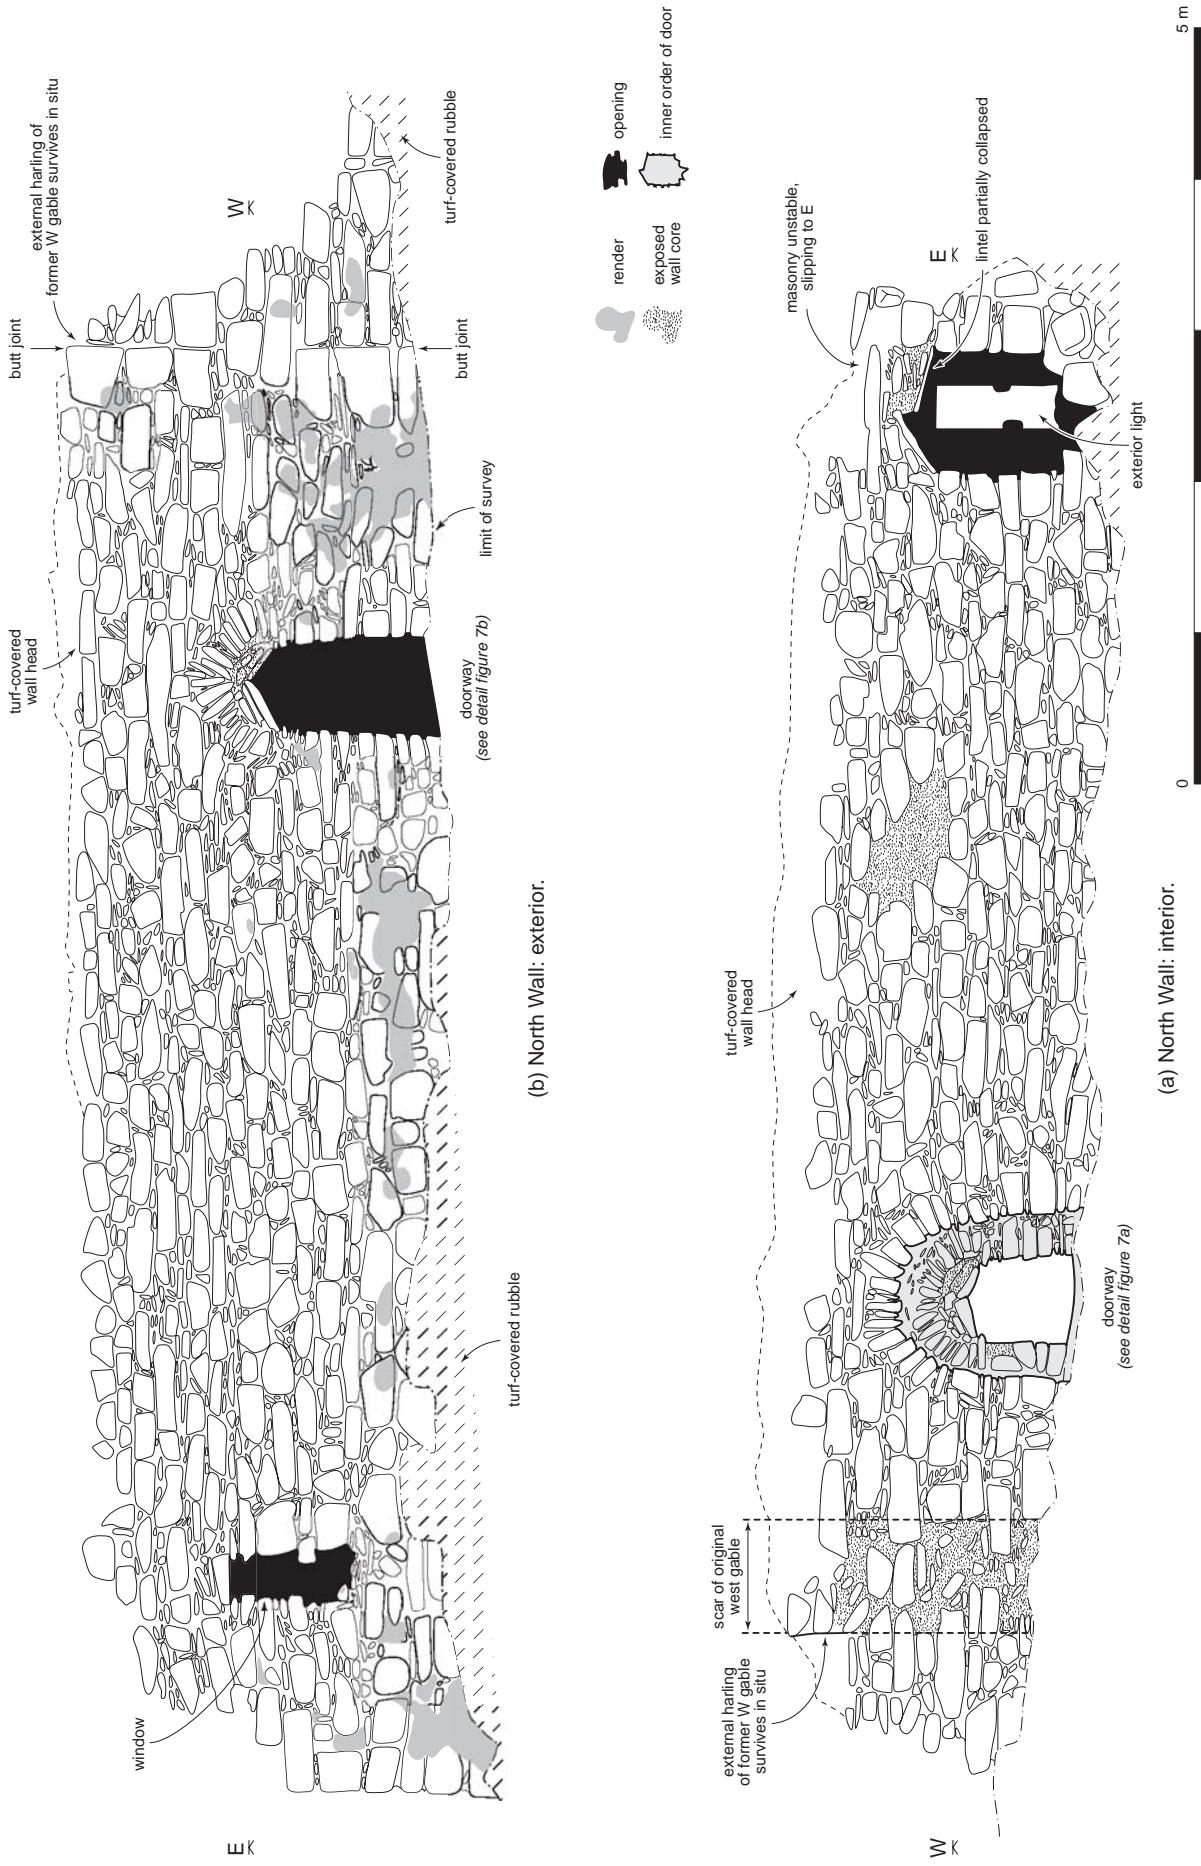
Building No 3, interior & exterior elevations of North wall.
